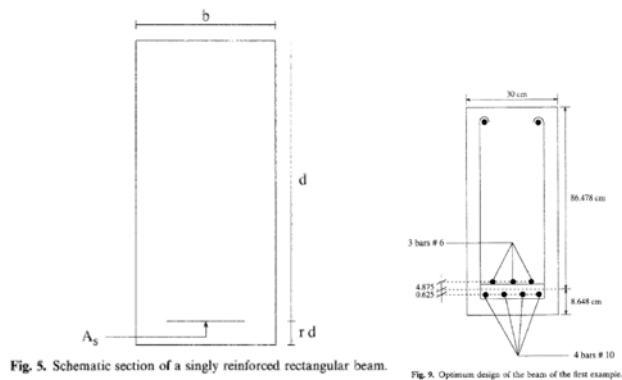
Schematic section of a singly reinforced rectangular beam.
